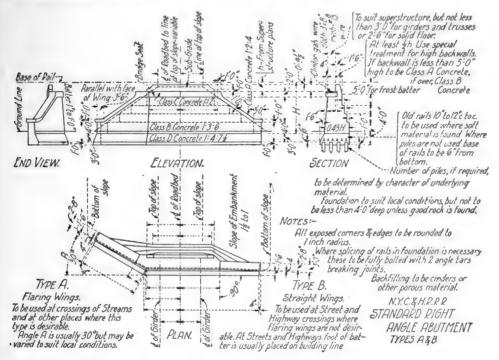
Masonry Abutments, N. Y. C. & H. R. R. R.
